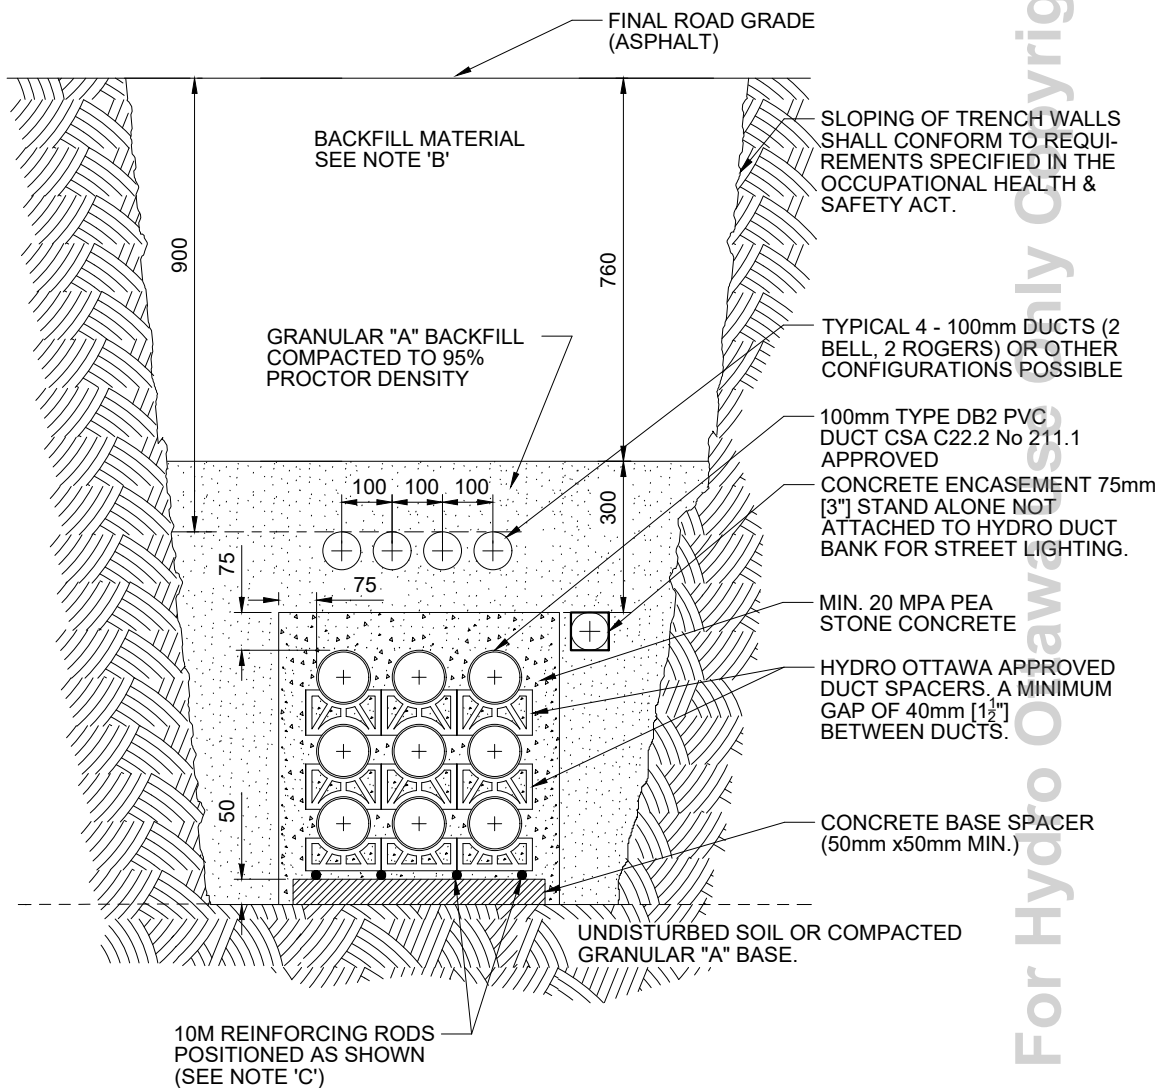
TYPICAL CONCRETE DUCT BANK SECTION VIEW
